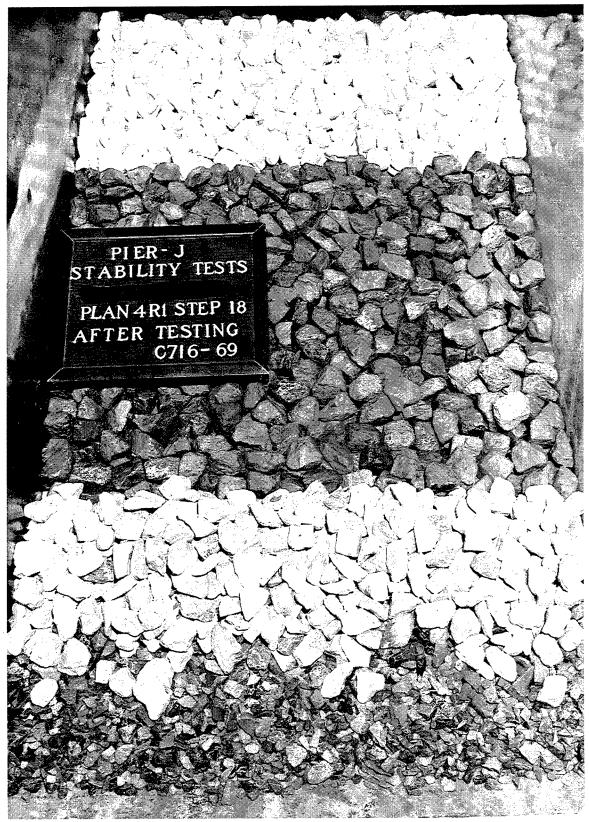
Sea-side view of Plan 4R1 after testing step 18 of Hydrograph 3A
